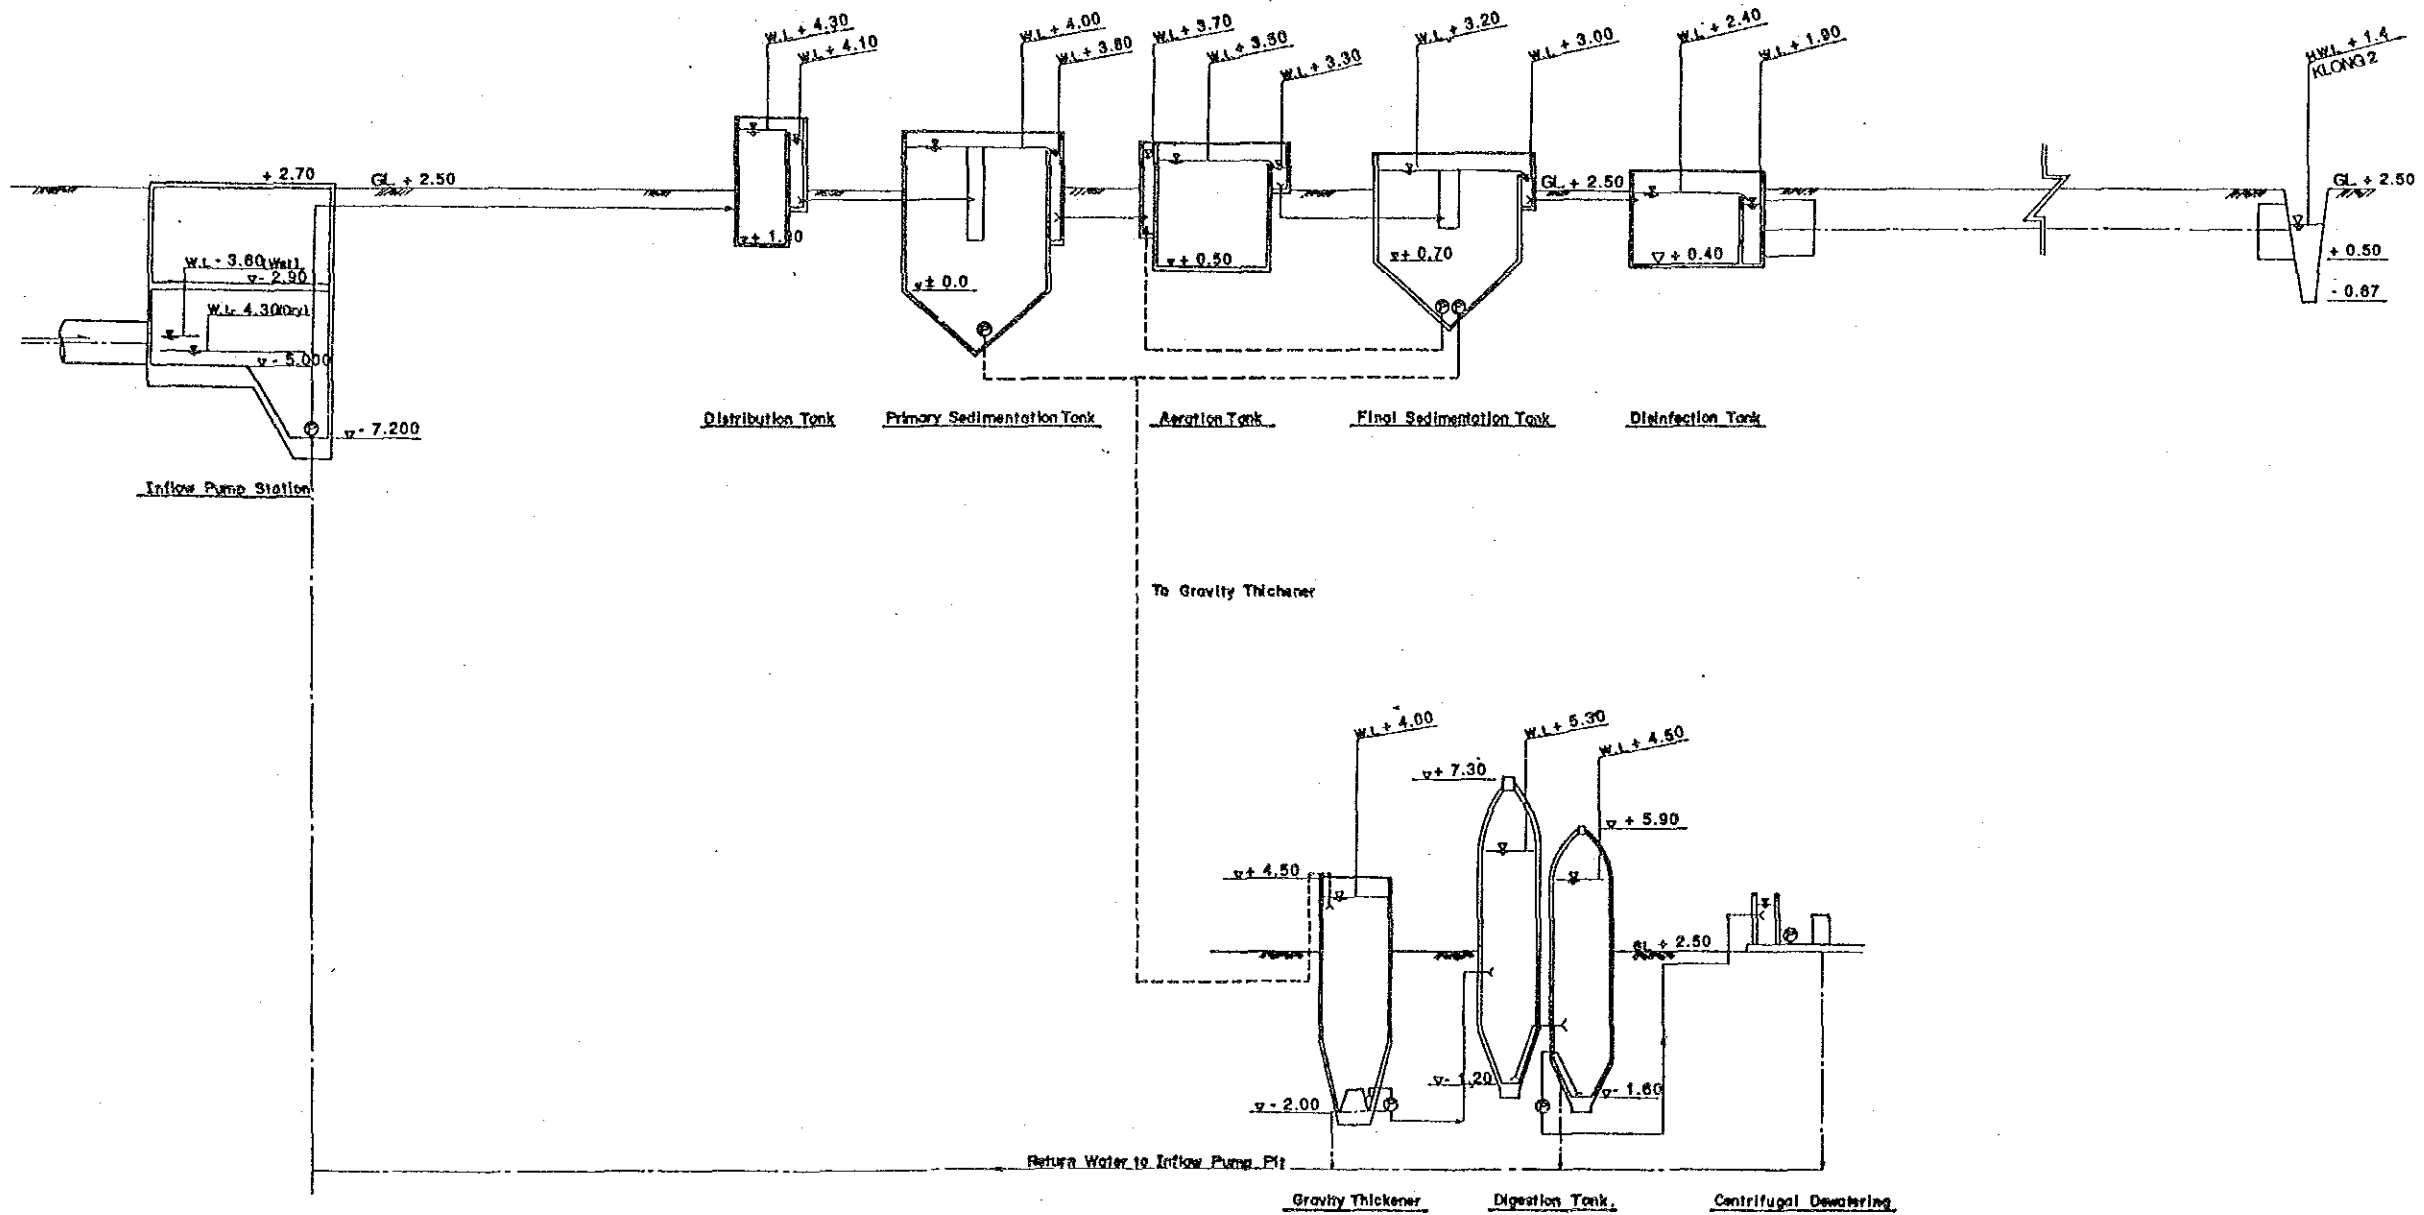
Hydraulic Profile of Sewage Treatment Plant (Rangsit)
